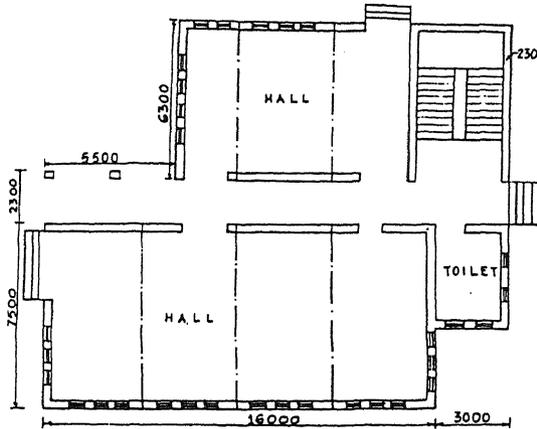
Ground Floor Plan of the Industrial Department building at Darbhanga.
